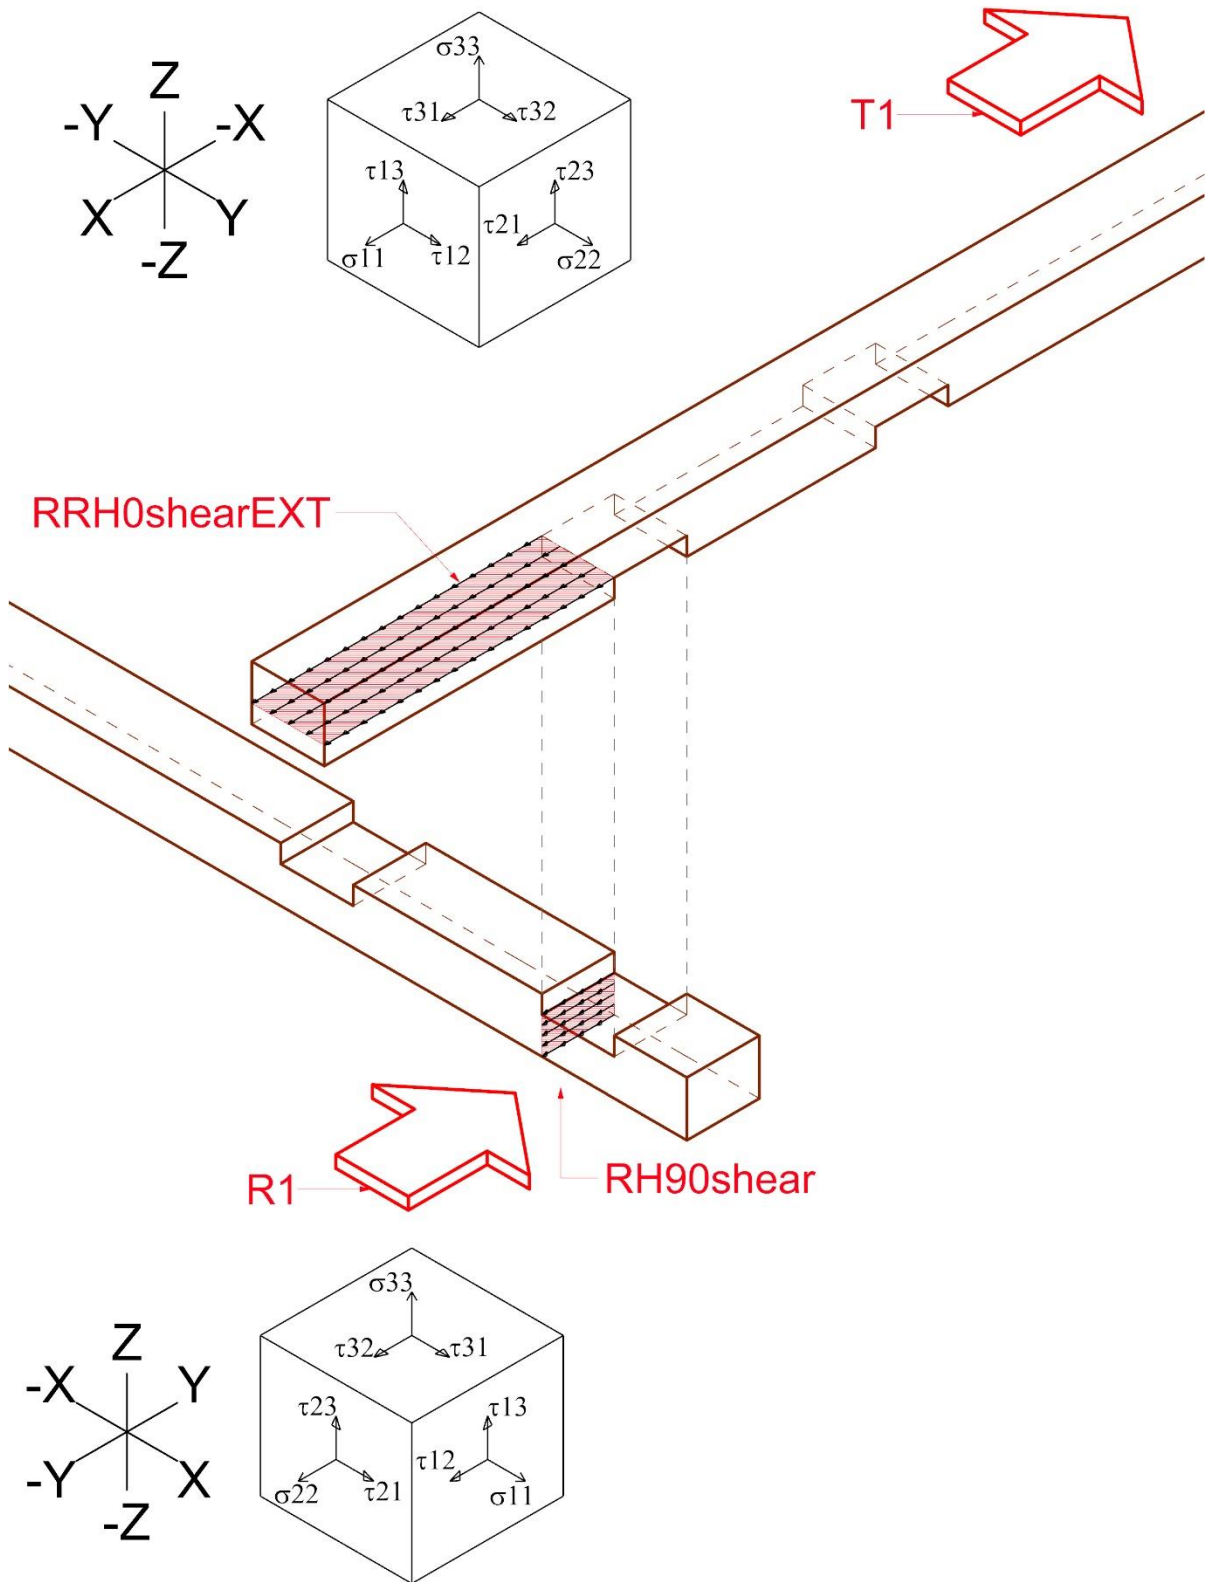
Roof Rafter Head Tangential stresses: Crossing rafters T1-R1
